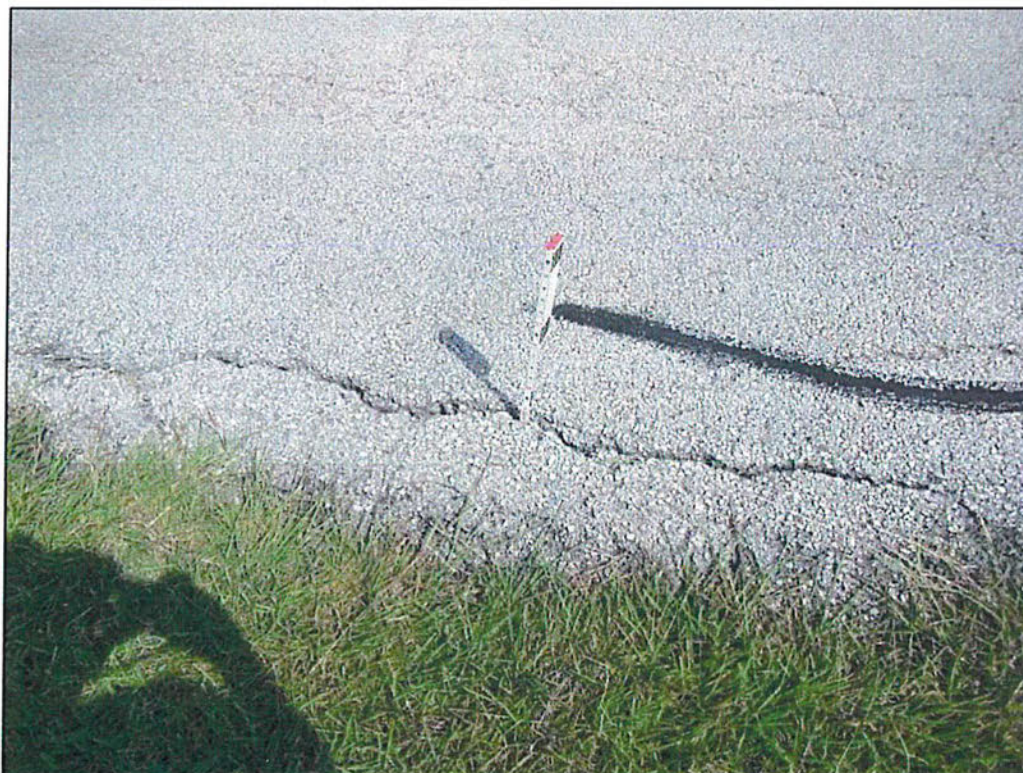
Crest. Typical cracking. Probed to 4 inches.
